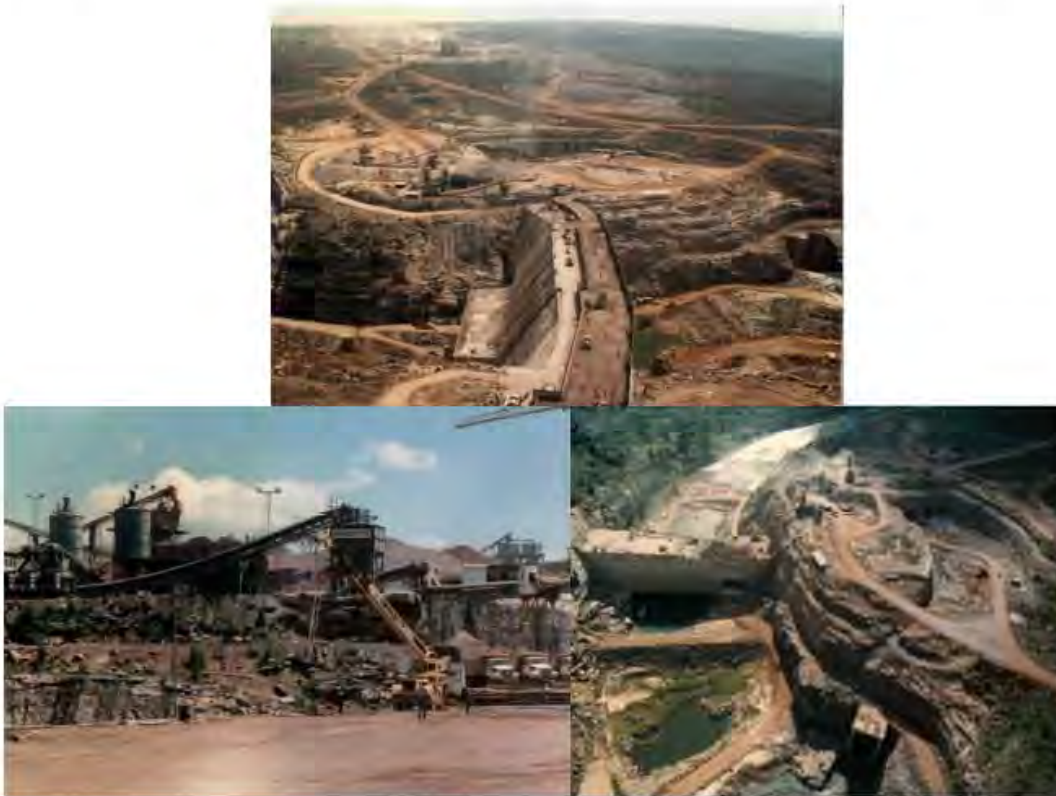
RCC batching plant near the center-mass-point, at Capanda dam- Angola.
